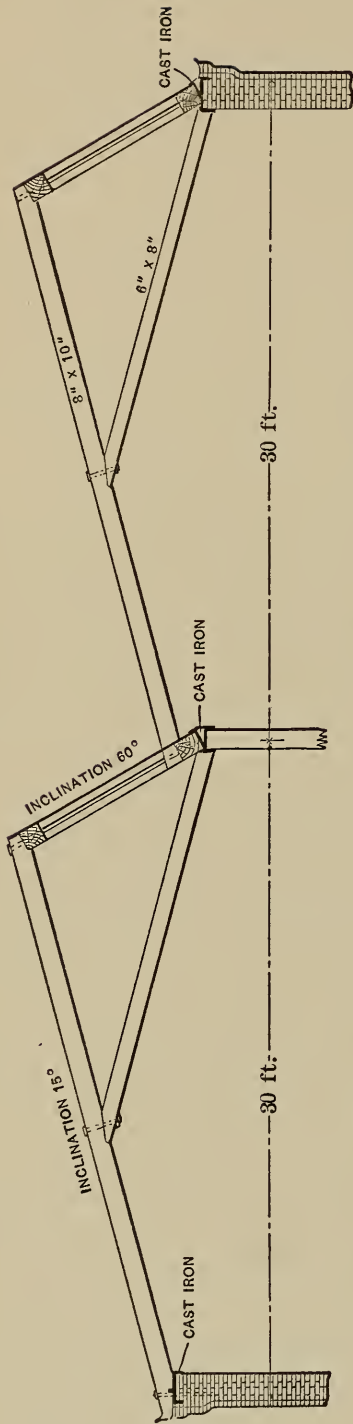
Longitudinal Section of Saw-tooth Roof of Wood Construction.
